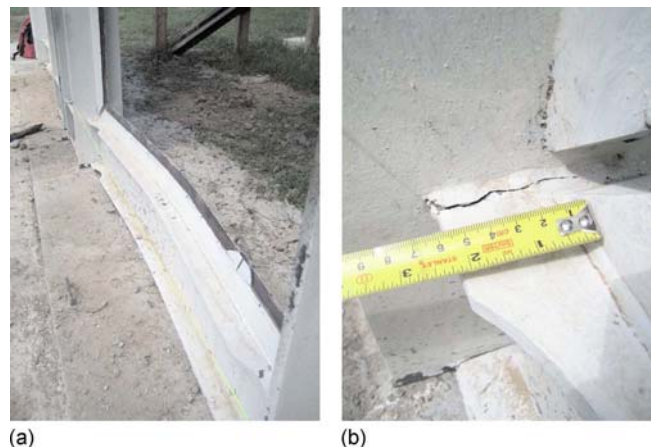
Photograph of SPSW 2 following Test 2: (a) bottom beam; (b) weld fracture beam-column connection
